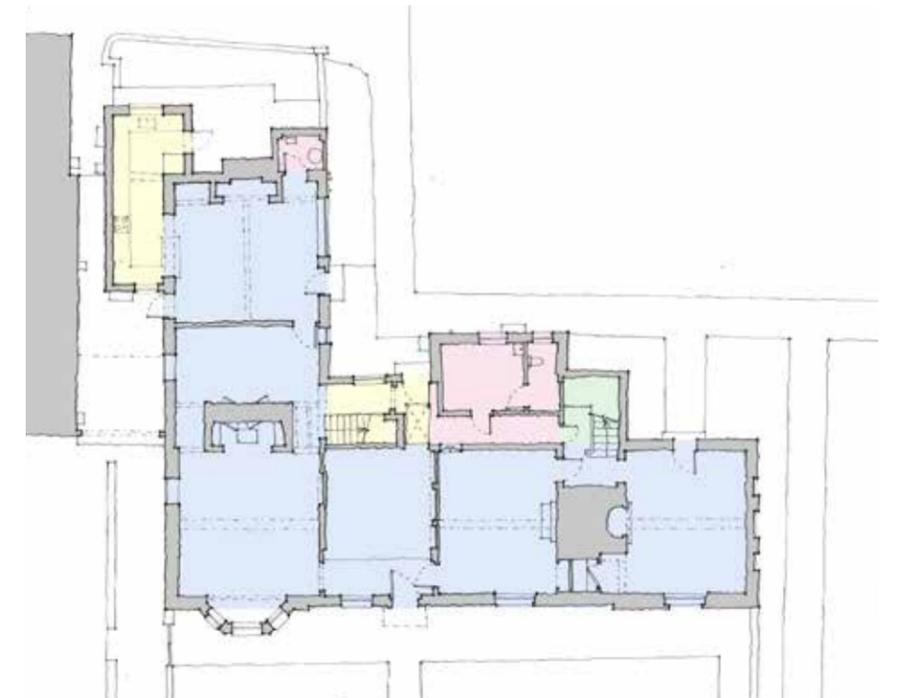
Historic Phasing Plan of Whitfield Court - Ground Floor (not to scale)
